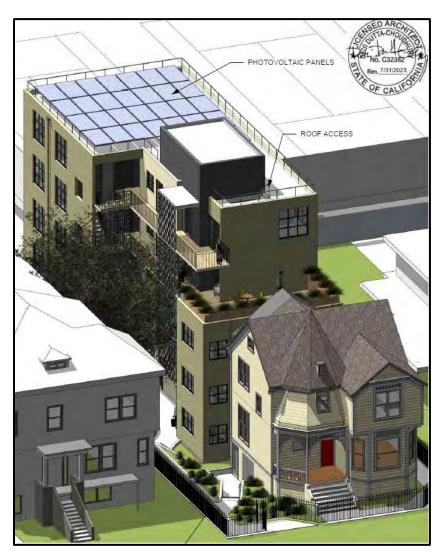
Site Diagram with Proposed Construction (Devi Dutta Architecture)
